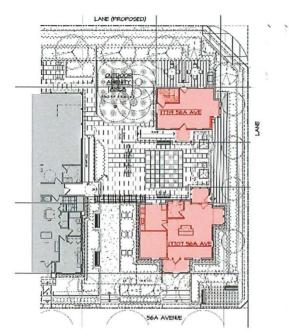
Proposed relocation of the Mooring House & Cottage with new development on the left (drawing by Barnett Dembek Architects Inc.)
